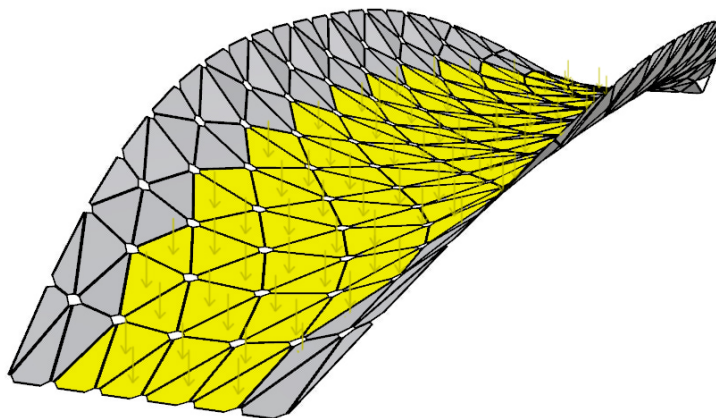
Loadcase 1: a live load of 3900 N/m^2 on the walkable area of the bridge
